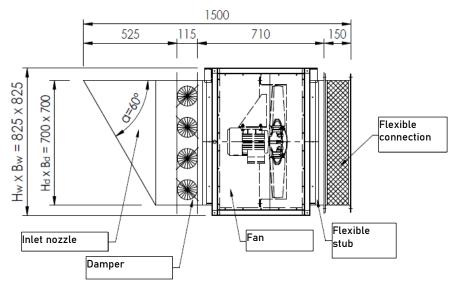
Basic dimensions of the standard mcr EXi-F 63-1 air supply units in a box-type housing - horizontal installation.
